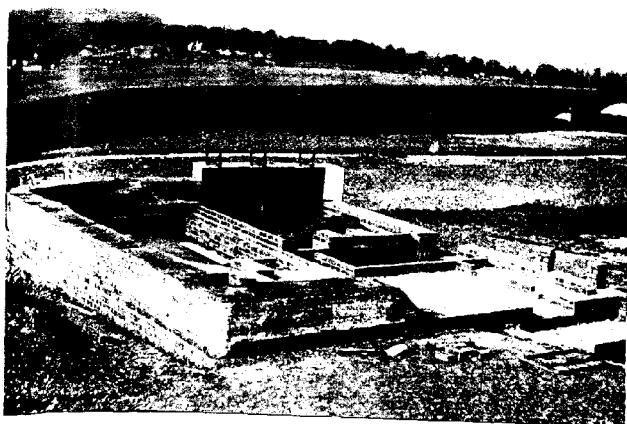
Pisé de terre walls on brick base. Shuttering in position on wall.
